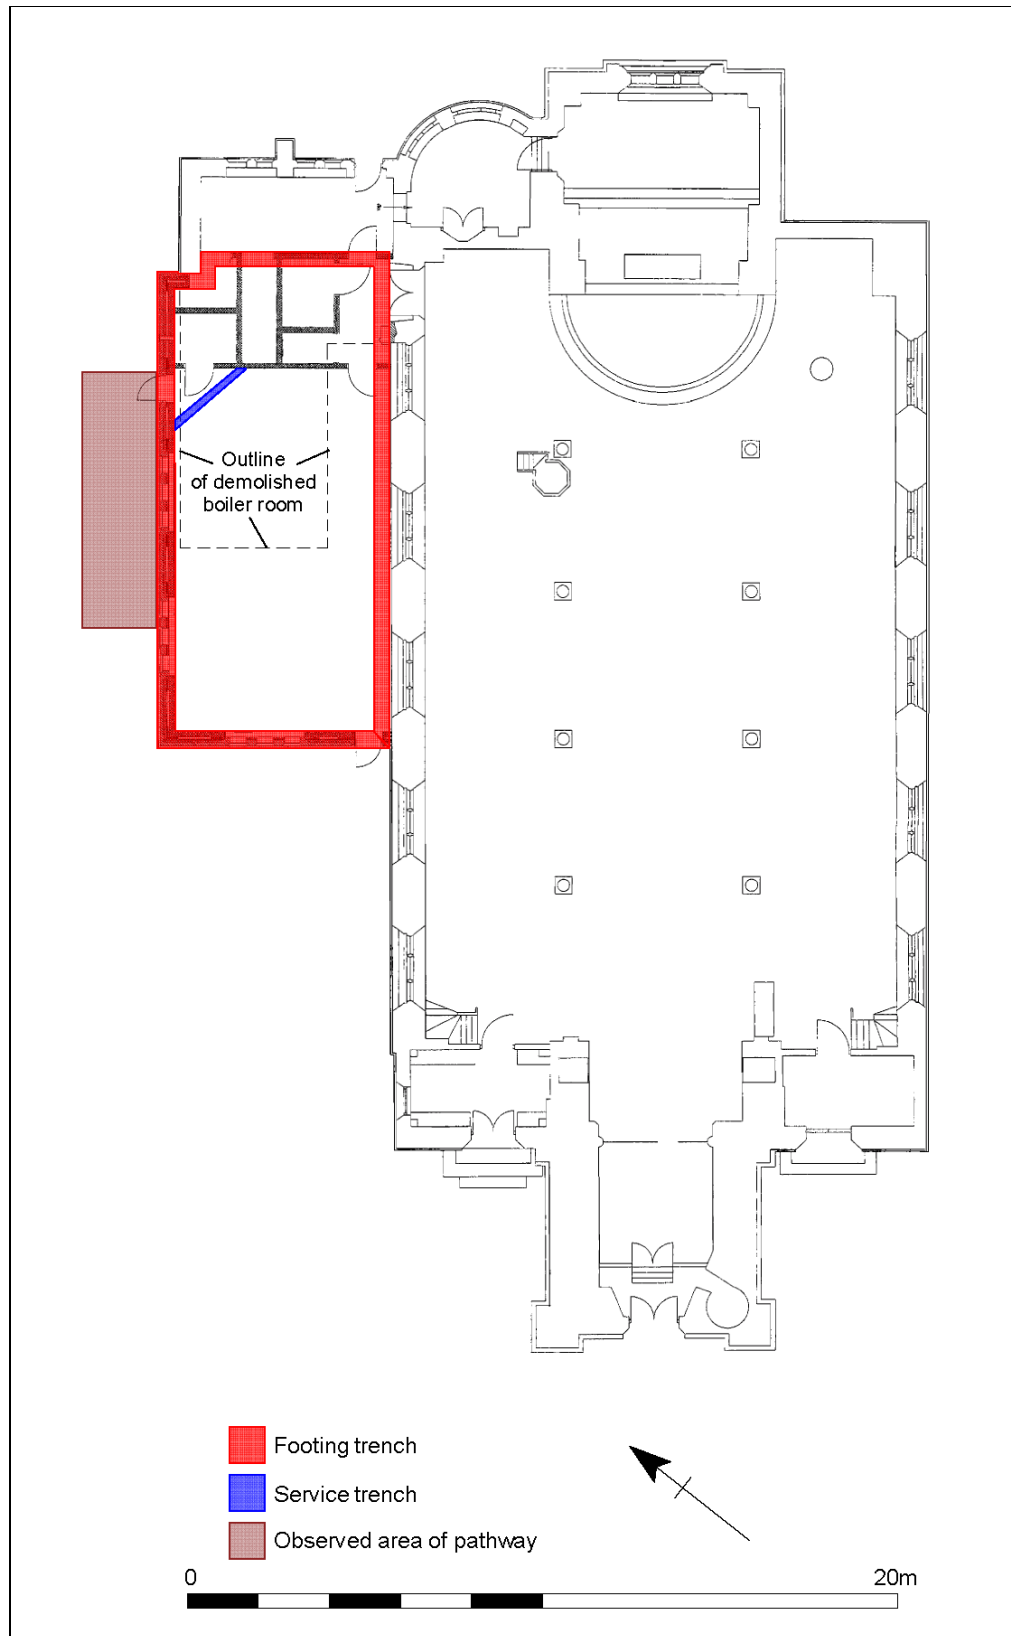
Plan of footing trench, observed service trench and part of pathway (*scale 1:200*)
